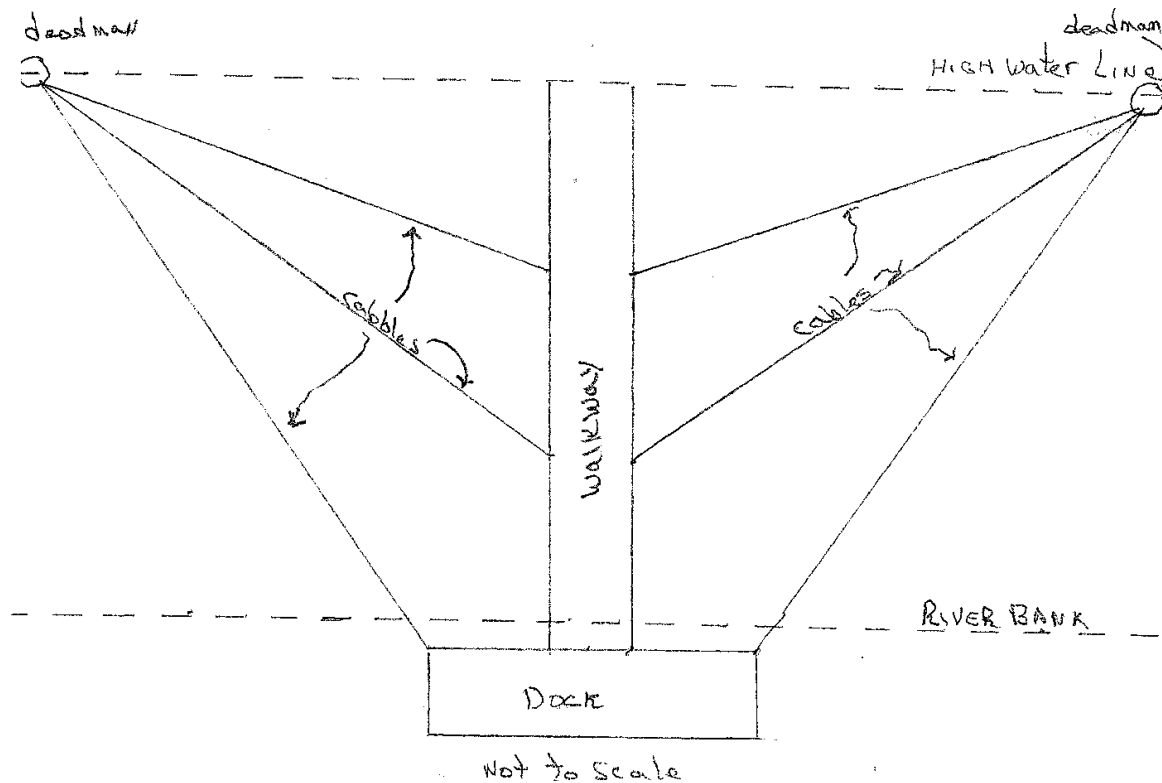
Plan view of the proposed dock installation, which included the installation of six stabilization cables.
